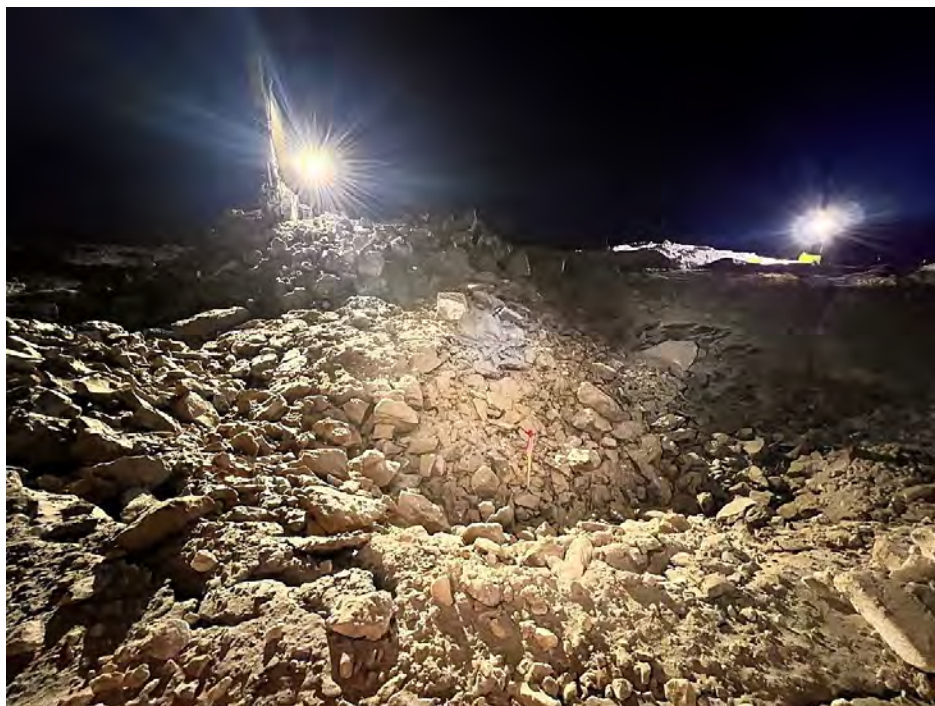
CV-059 looking northwest at the blasting excavation in the area of the culvert inlet (February 23, 2024)
